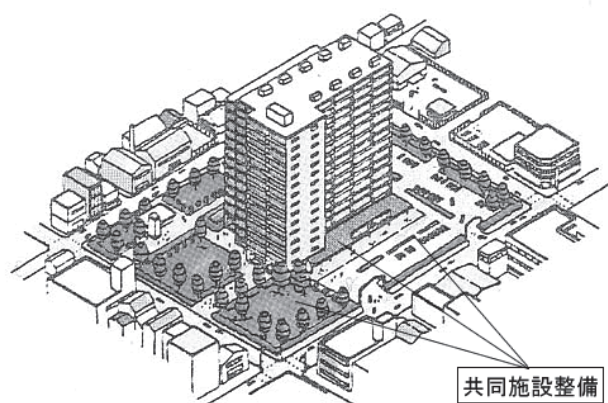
Image of Development of Excellent Buildings etc. (Source: MLIT)
